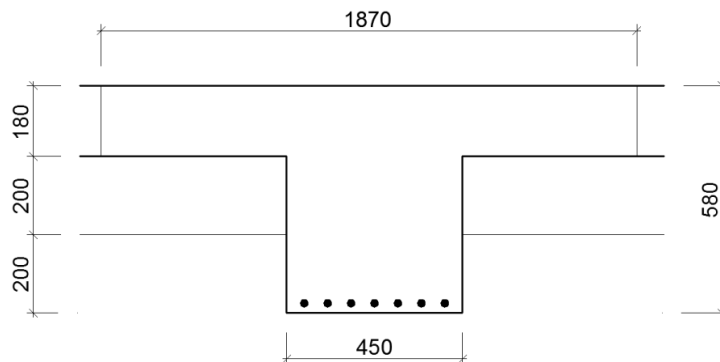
Shape and dimensions of a section of the transverse beam after renovation in the continuity reinforcement
